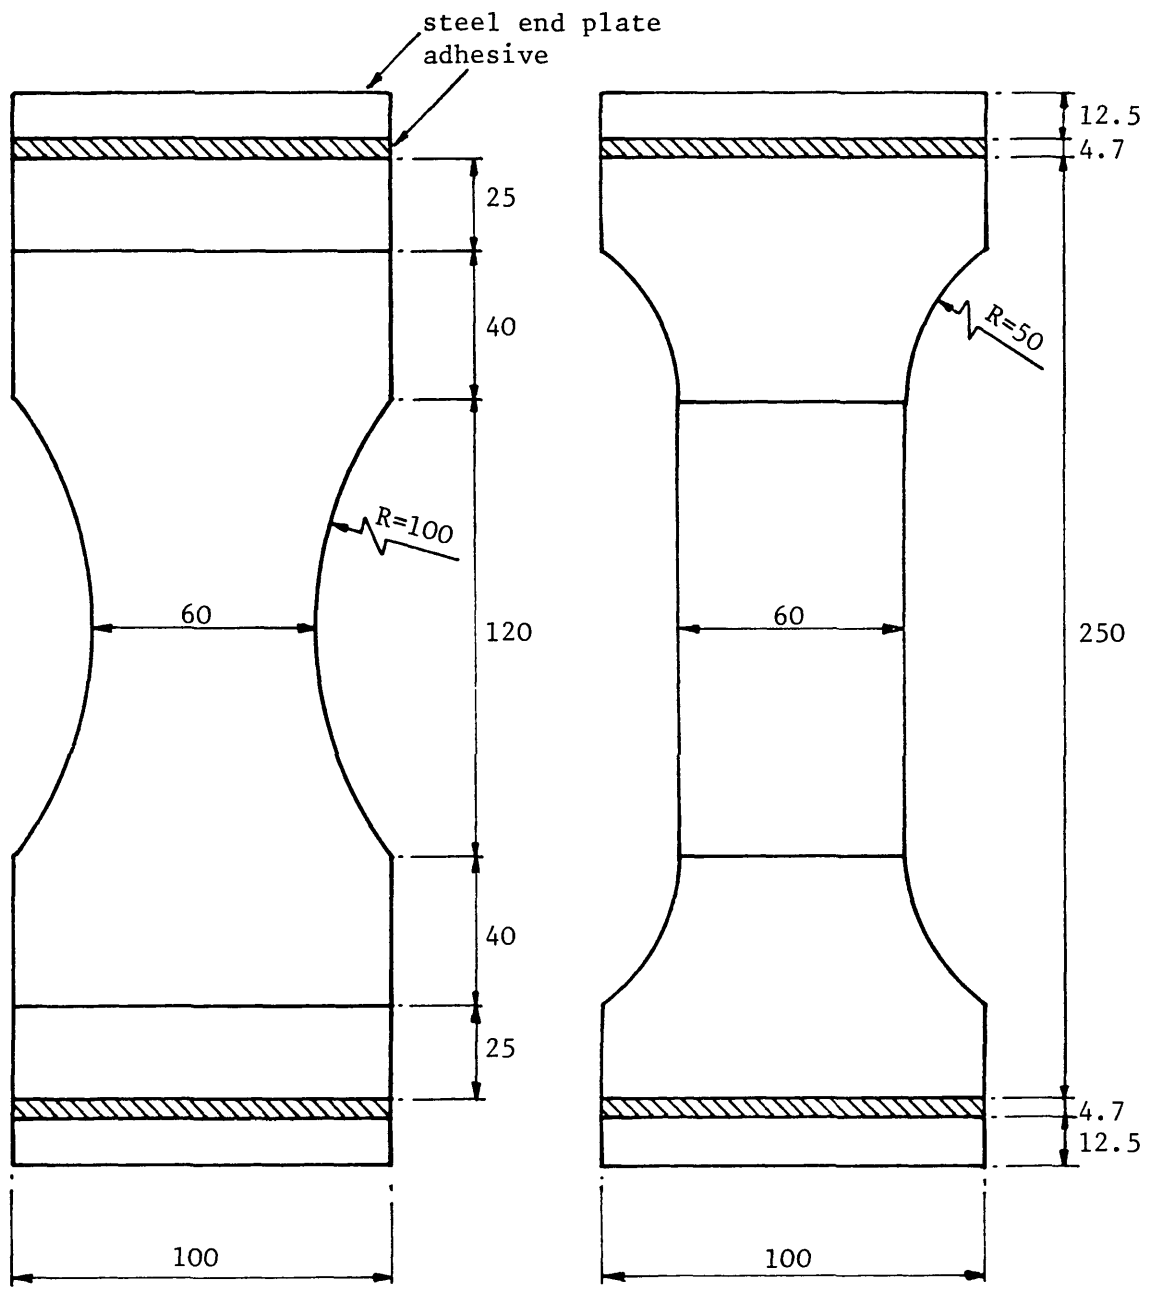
Direct tensile specimen with end plates attached (dimensions in mm.)
